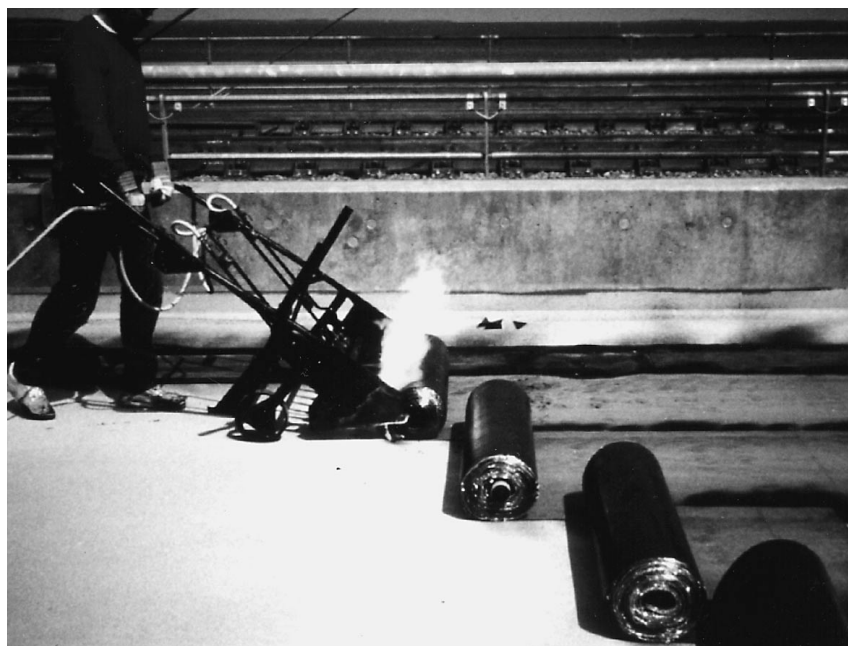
Bonding bitumen sheets to concrete bridge deck.
